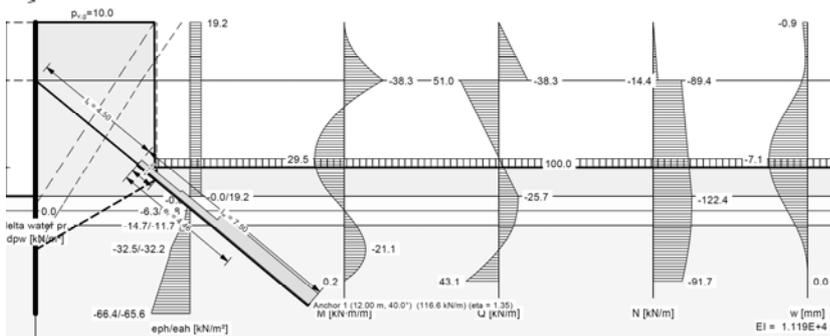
Example of excavation stability analysis with the first row of anchors next to Hites building
